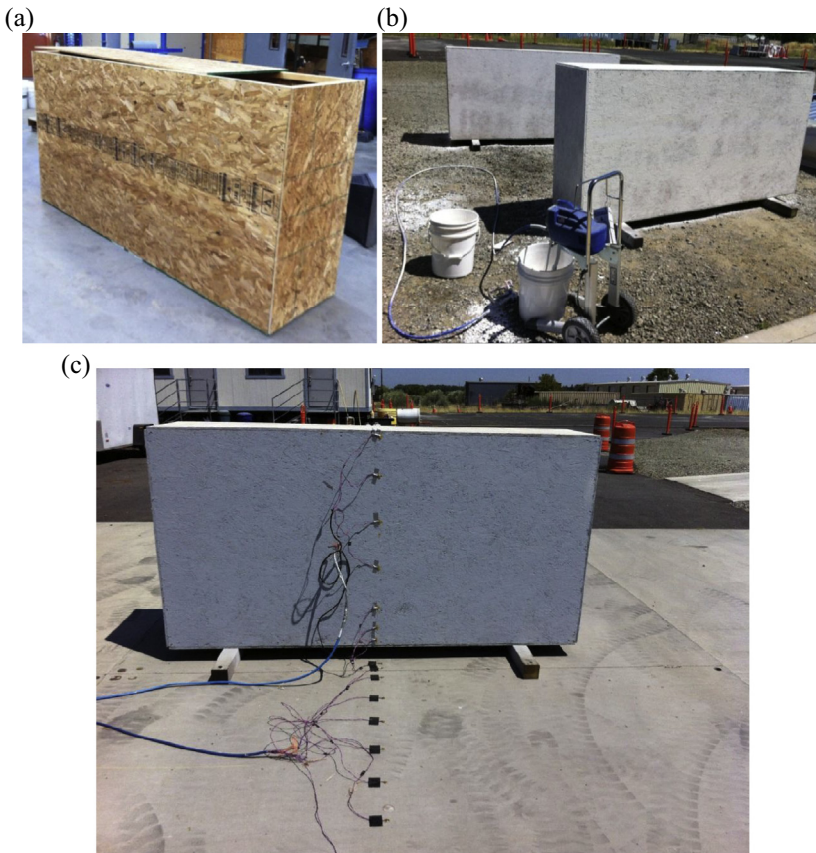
Preparation of building walls and example test setup with temperature sensors. (a) Raw wall. (b) Wall painting. (c) Example test setup with temperature sensors.
